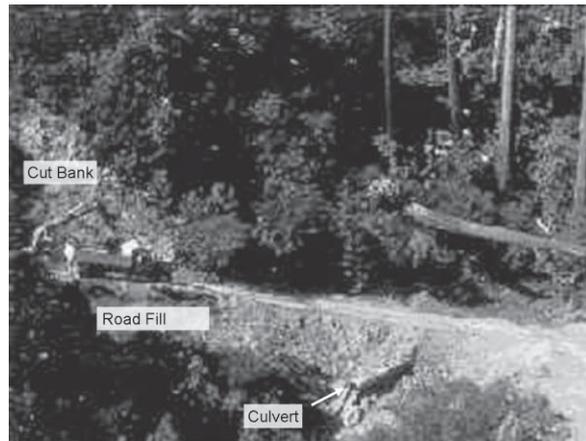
Recently deforested hillslope in the Redwood Creek catchment showing a network of road segments and road-stream crossings on major forest roads. At stream crossings, culverts convey runoff under the road prism.
